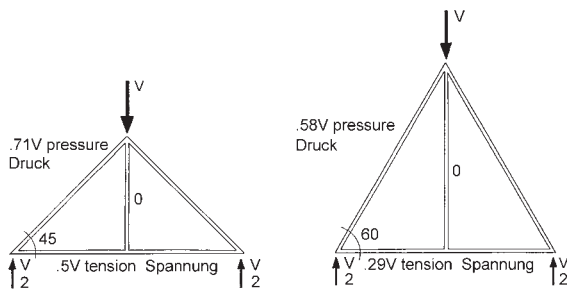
Forces acting in centric loaded, simple roof trusses.
